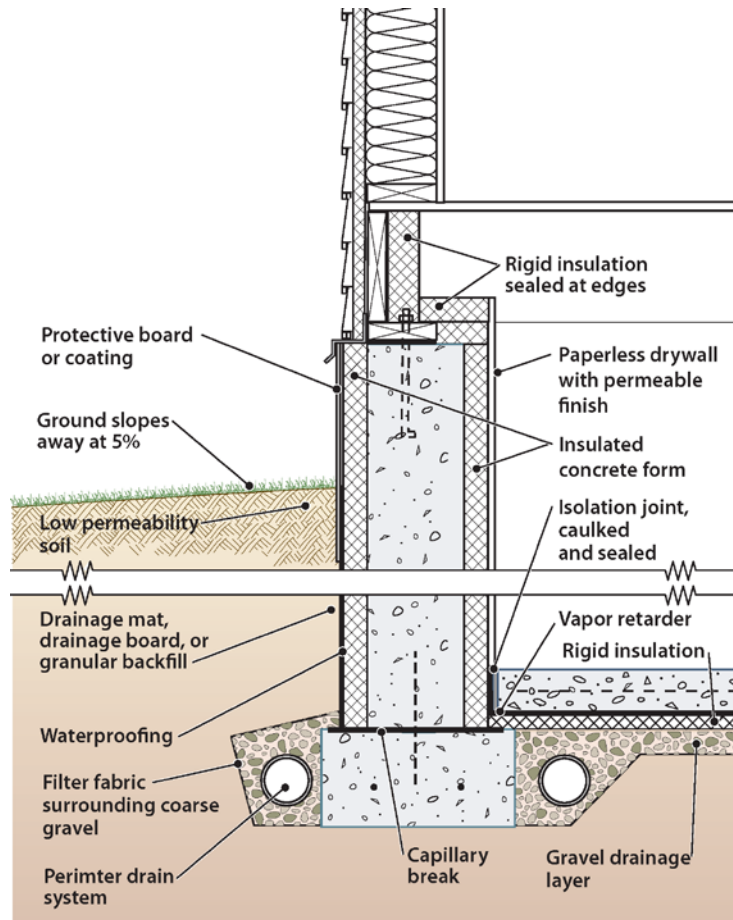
Cast-in-place concrete foundation wall with insulated concrete forms
